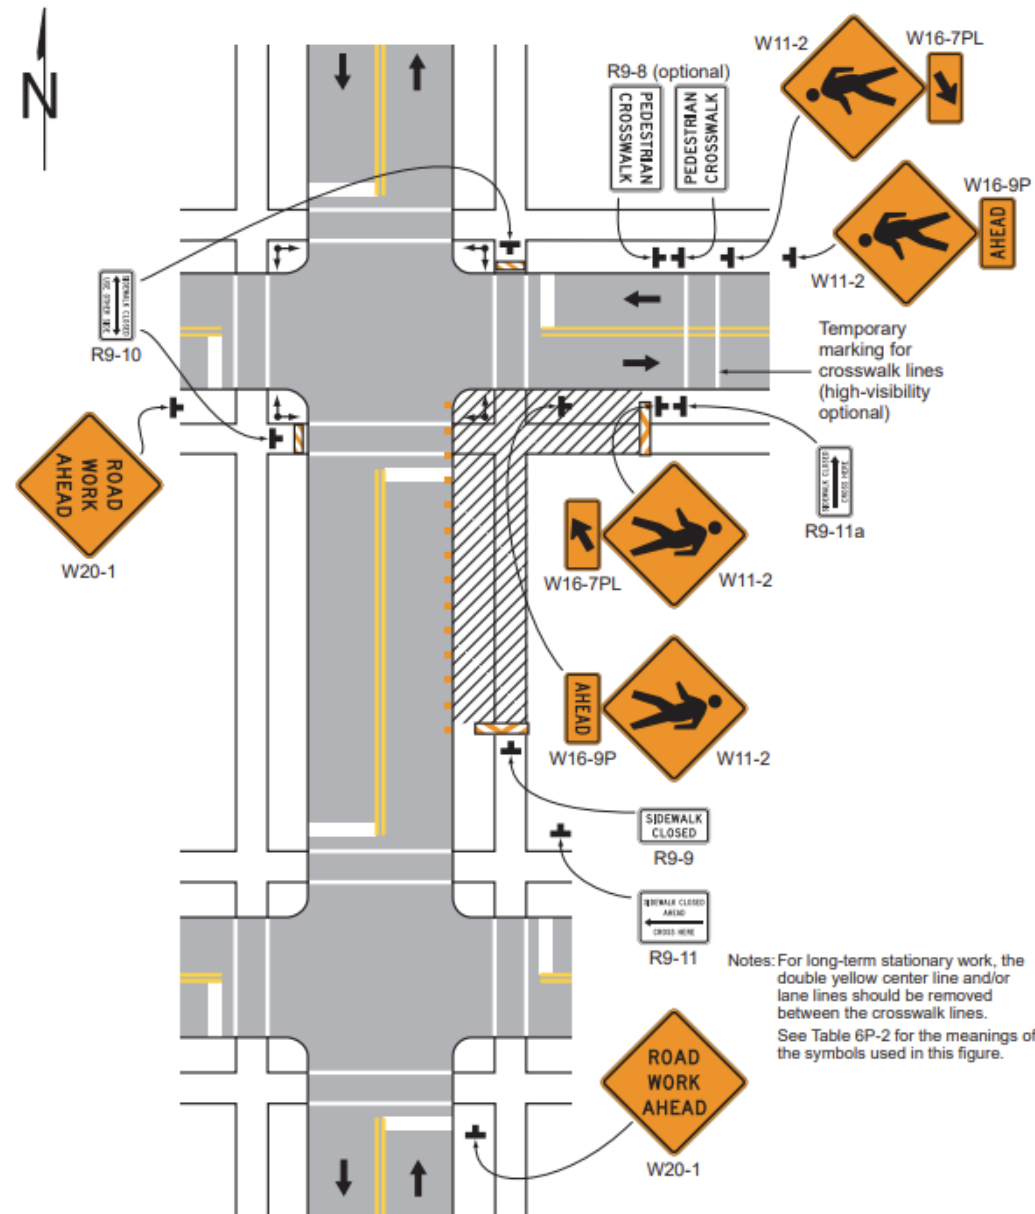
P-28. Sidewalk Detour or Diversion (TA-28)
